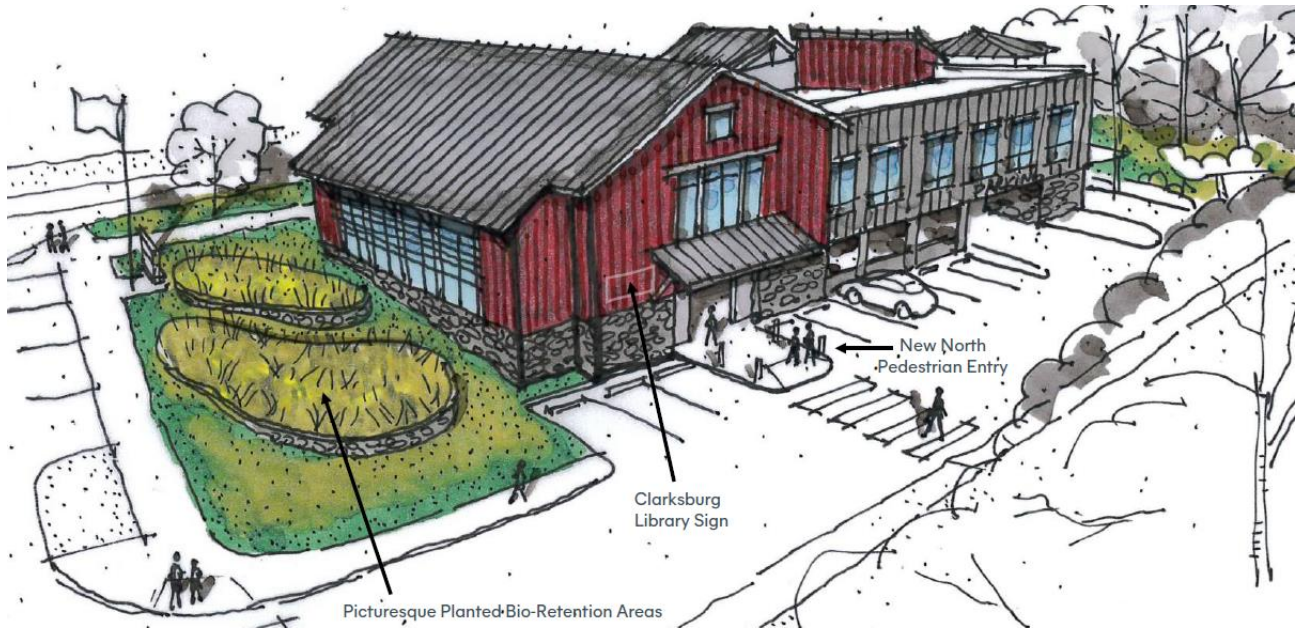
Site perspective looking southwest from Clarksridge Rd.
